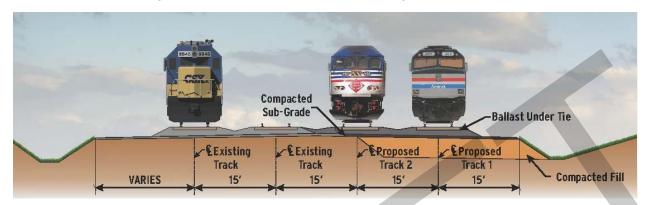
FOUR TRACK TYPICAL SECTION.
